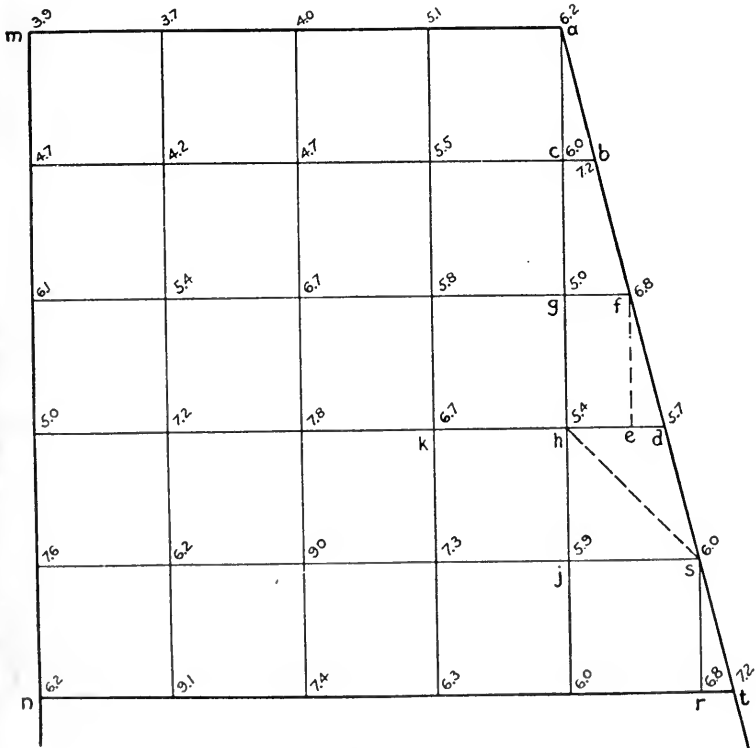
PLAN OF PORTION OF A BORROW-PIT.
